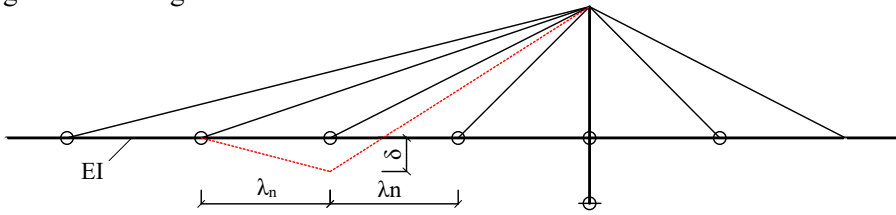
Beam on elastic foundations (Svensson, 2015)
